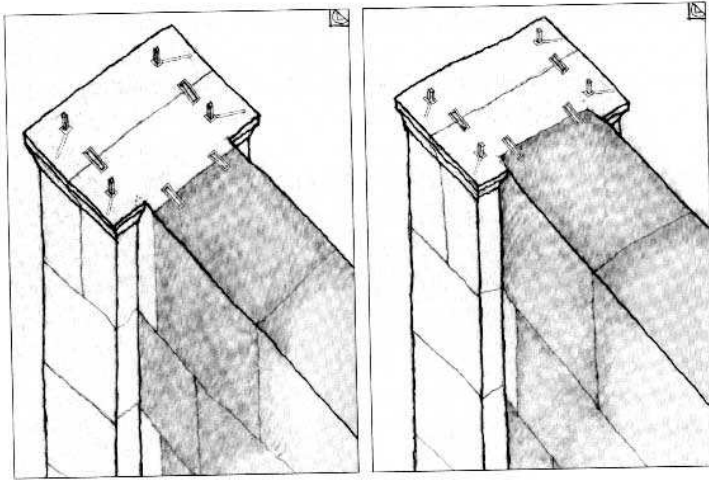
Typical capital detail (left) and detail on pier at end of wall 25/26 (right)
